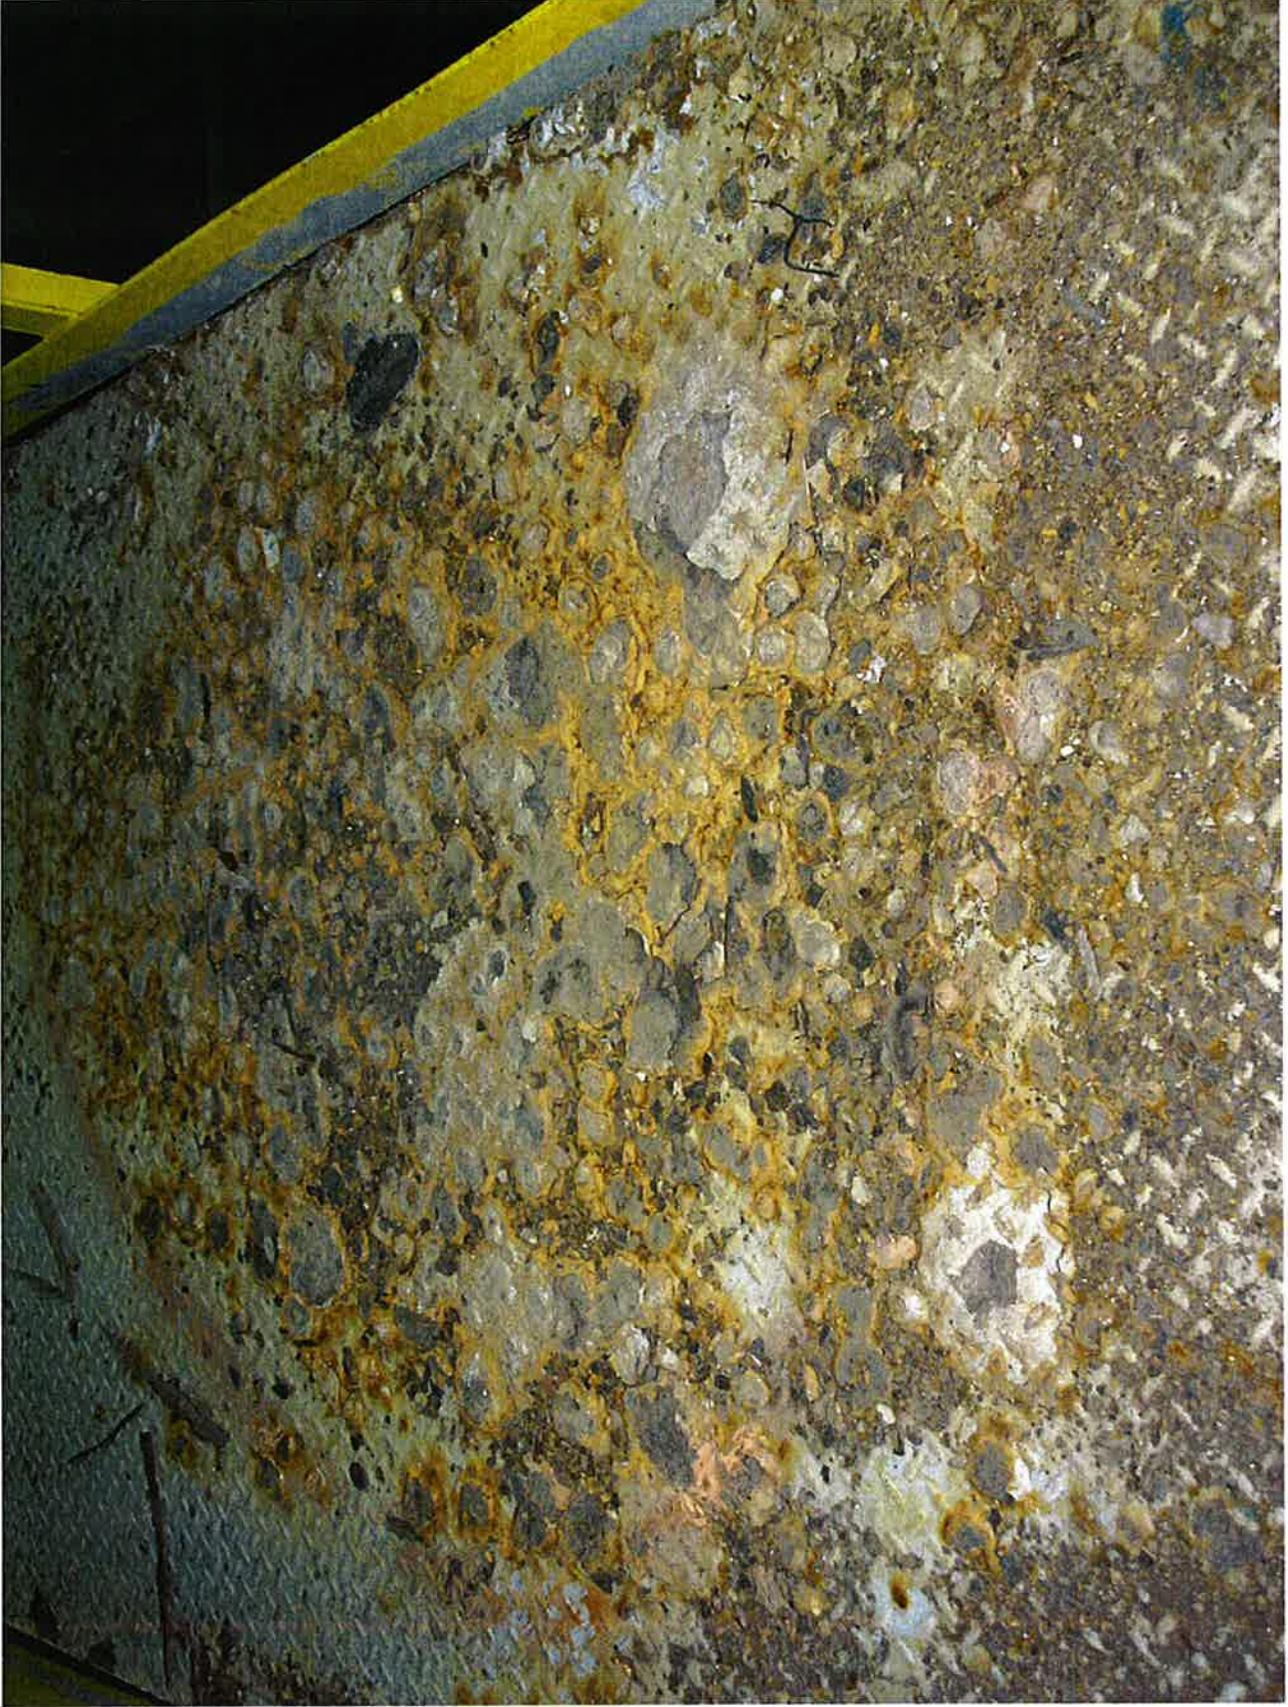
COMPROMISED CHECKERED PLATE AT SECOND LEVEL OF WEST HALF OF BUILDING 2
